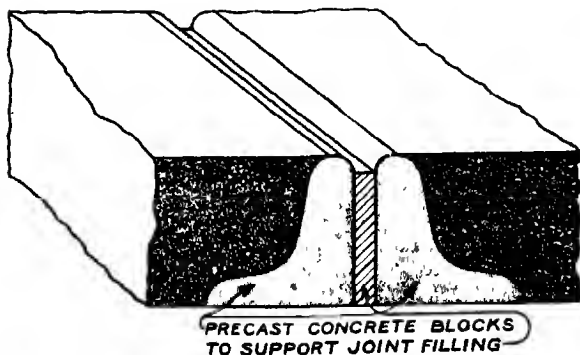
PREFABRICATED JOINT FOR CONCRETE ROADS
